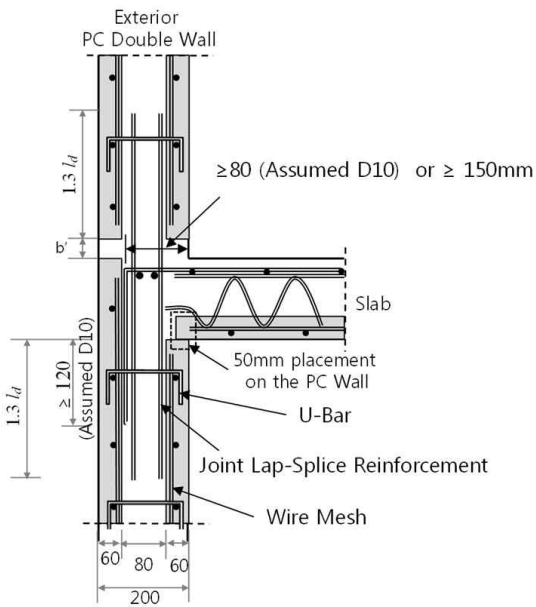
Exterior PC double wall-slab Joint (unit:mm)
